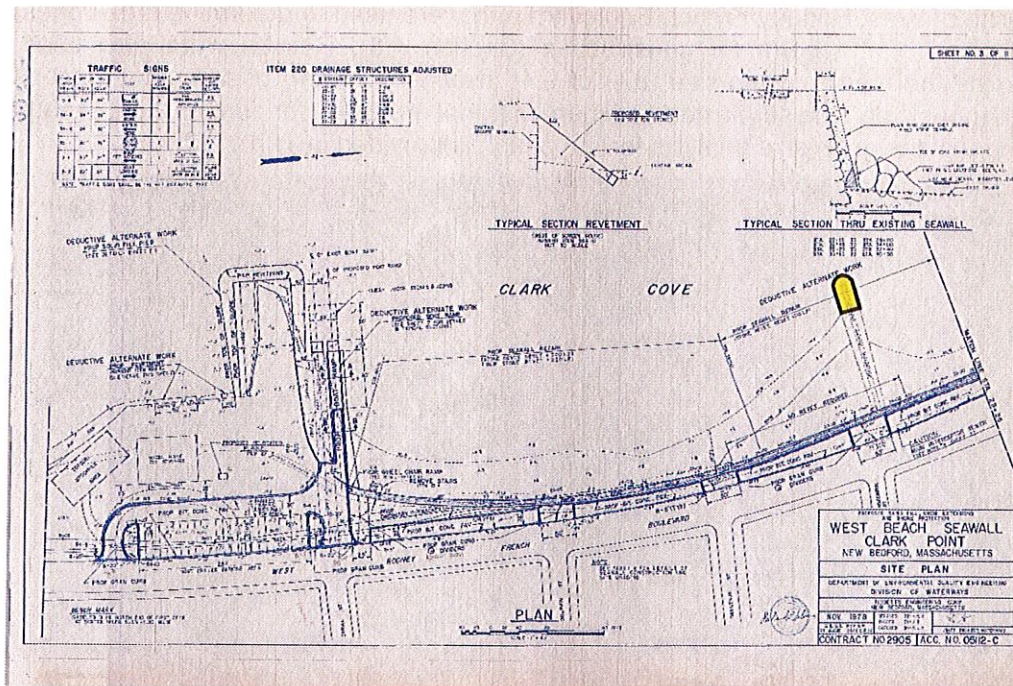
Tibbetts Engineering 1978 plan of West Beach. The tip of Groin 6 (right) shaded in yellow will be adjusted to the adjacent breakwater T-head section.
